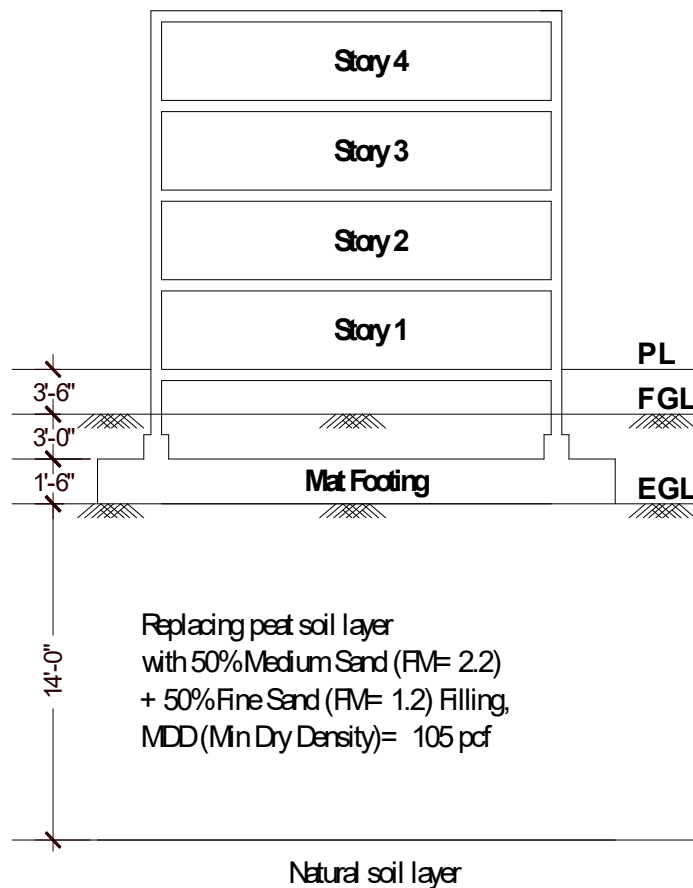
The foundation of low rise building on compressible peat soil deposit of KCC area.
